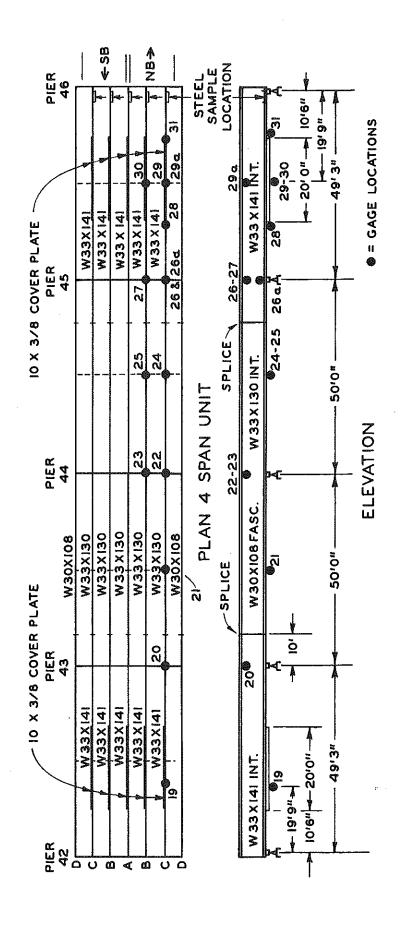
Strain gage and steel test sample locations for the four-span continuous structure on the north approach. Truck position, northbound, 2 ft from curb.
